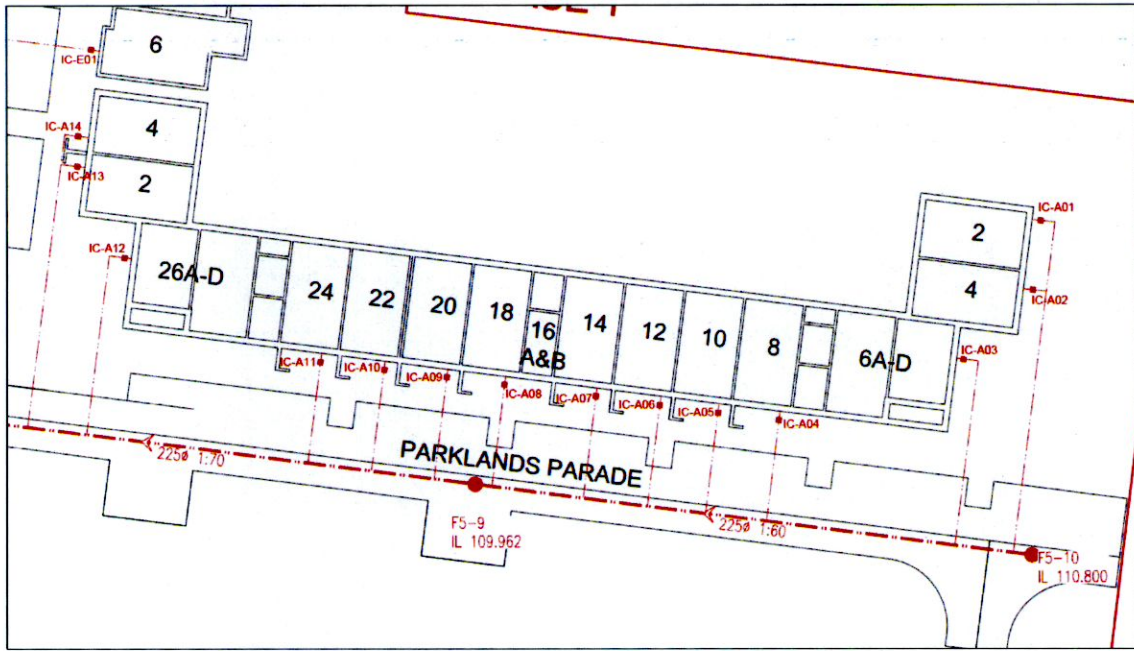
Foul drainage layout serving duplexes [Extract from as-built drawings]
